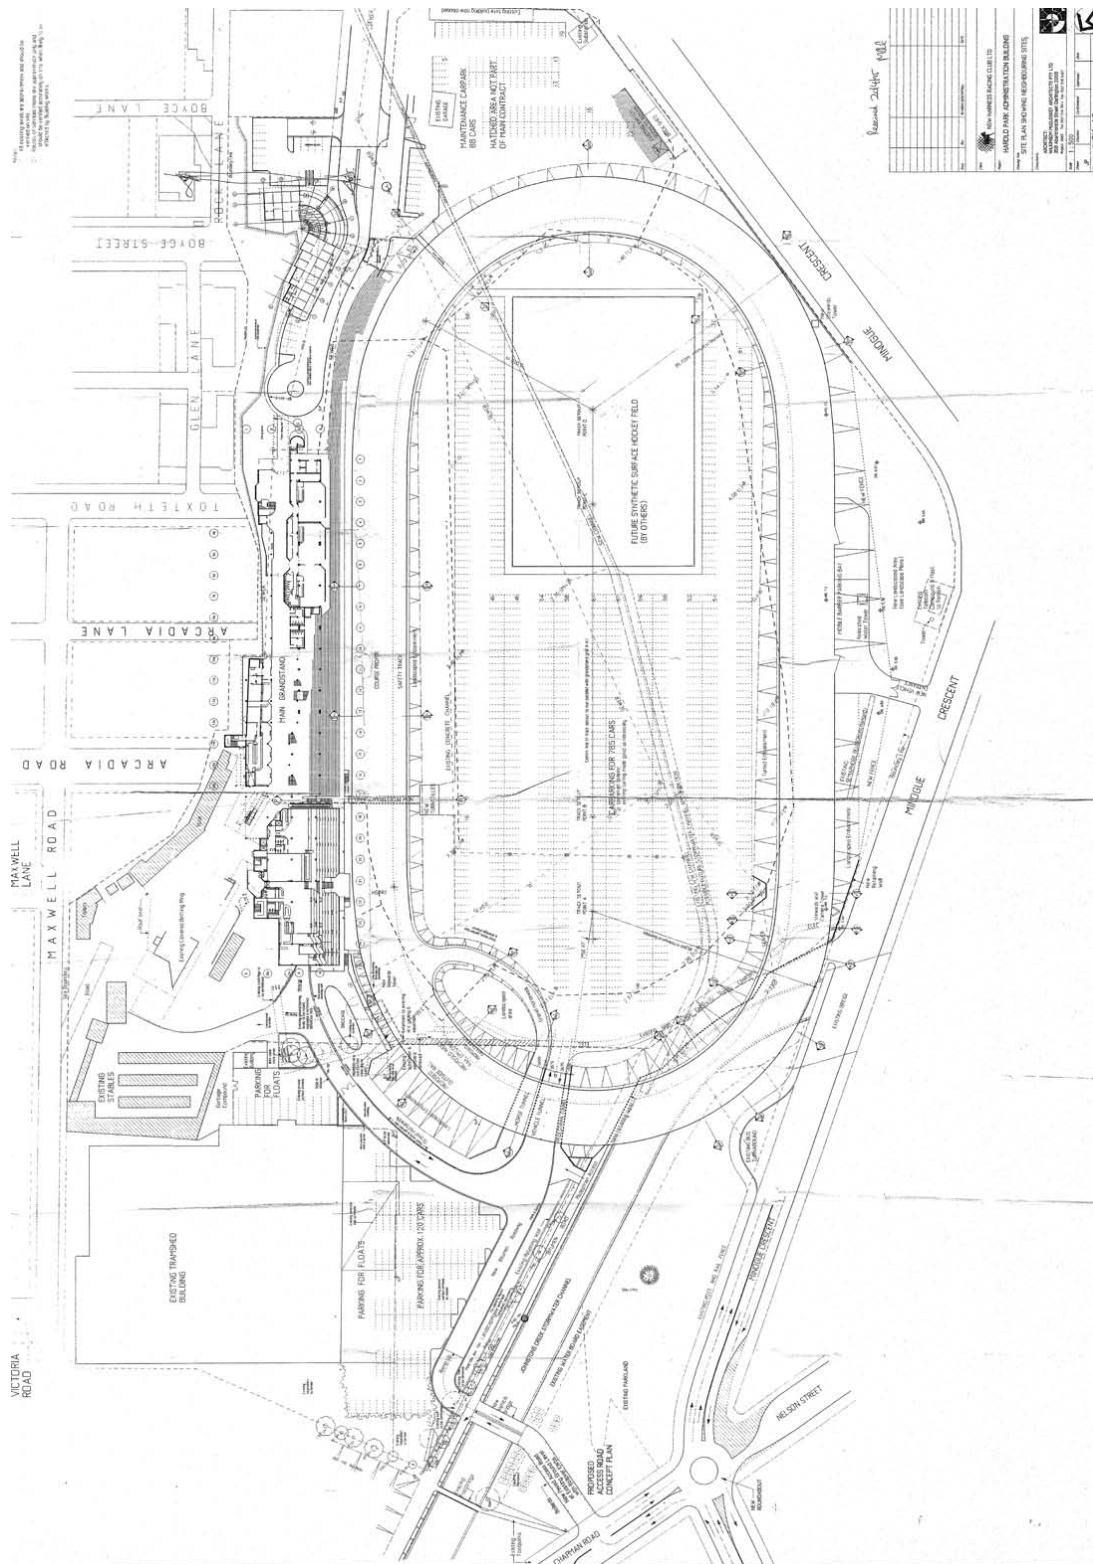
1995 Building Application Plan, Sydney City Archives
